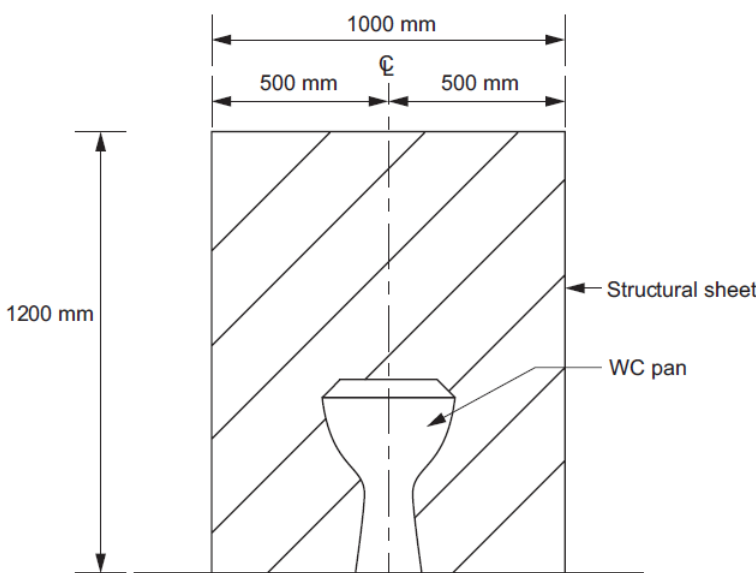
Location of sheeting for a wall behind a toilet pan
